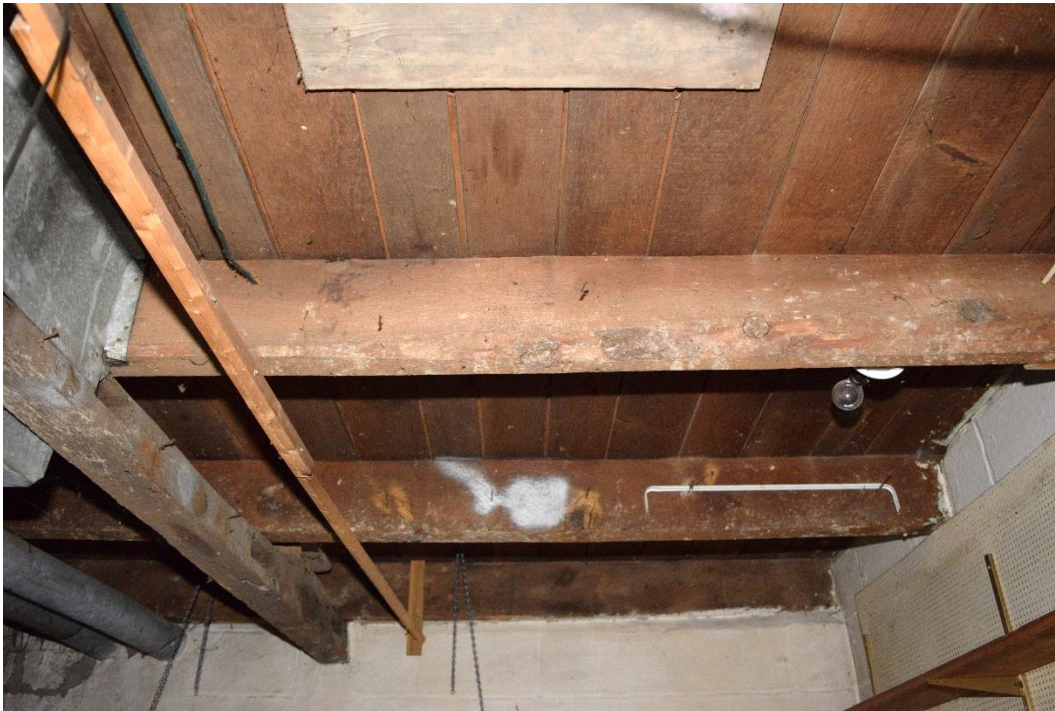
Planed wood joists and floorboards as seen from the Main Block basement.
